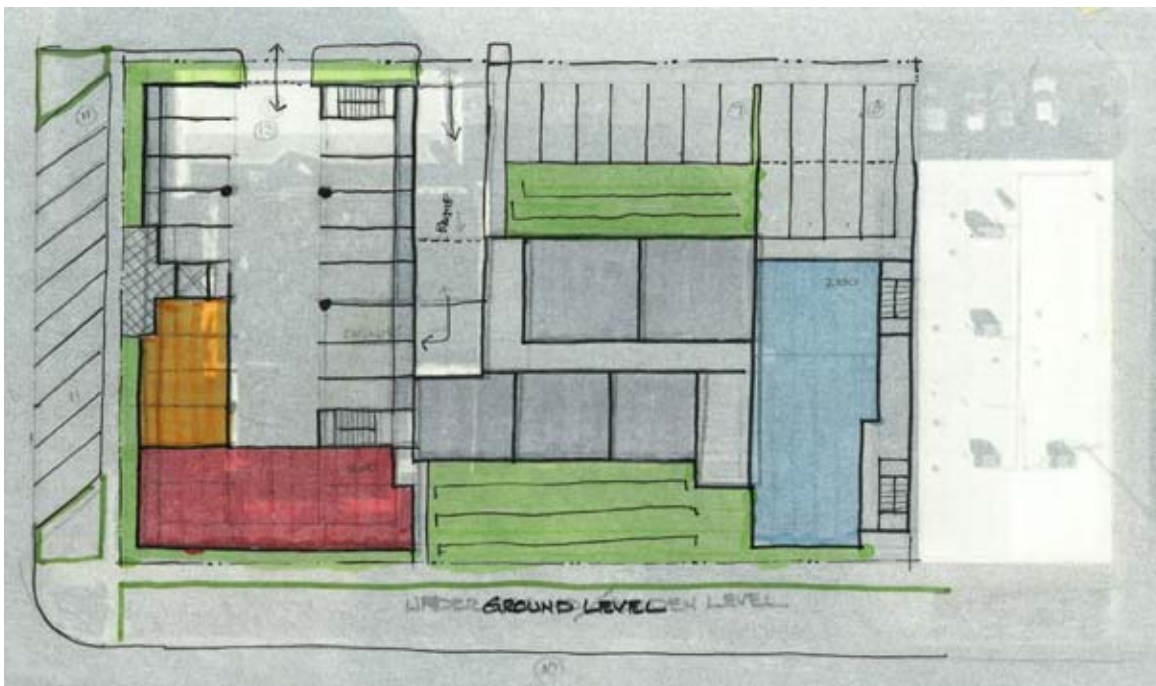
Floor plan showing the proposed layout of the ground level of White Hall.
